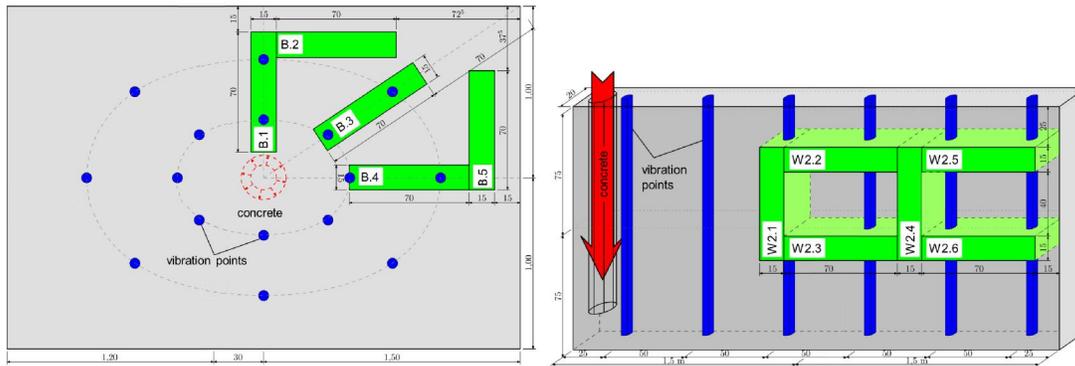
Experimental setup of the basement (top view) and wall 2 and arrangements of the bending beams (equal for both walls)
